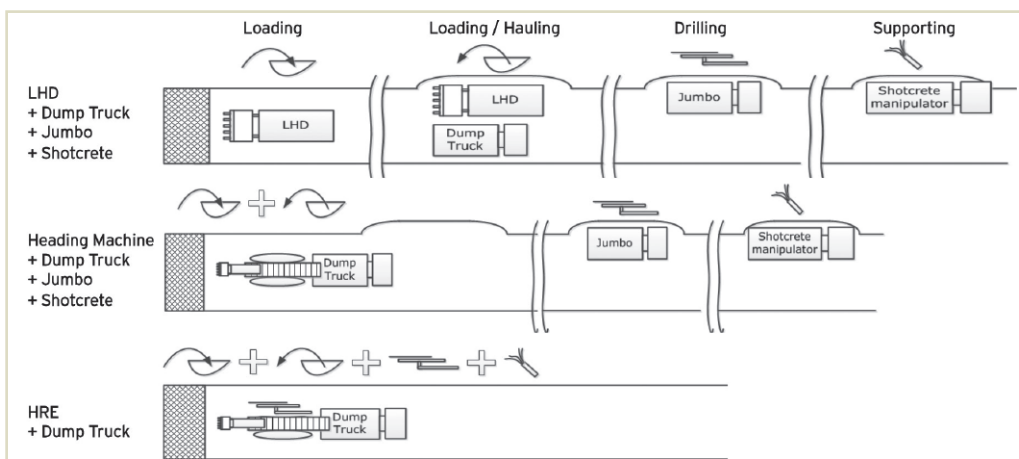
Operating equipment and bay spacing in roadway drivages using LHD machinery, conventional tunnel excavators and HRE technology.
